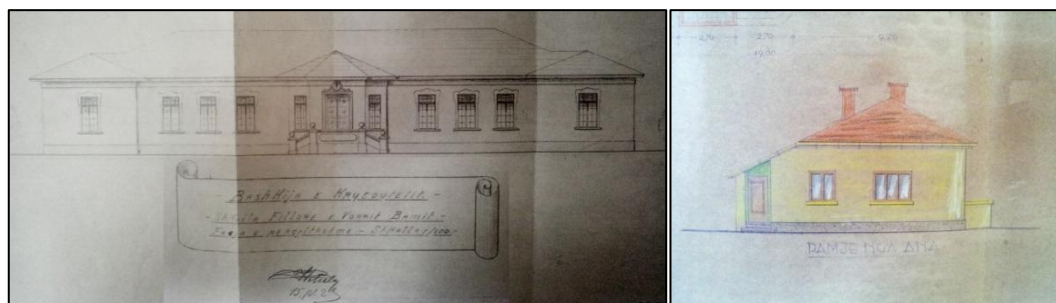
Elementary school of Vorri Bamit of the 1929 year (left); one classroom village school buildings (right) (State Technical Archive).
